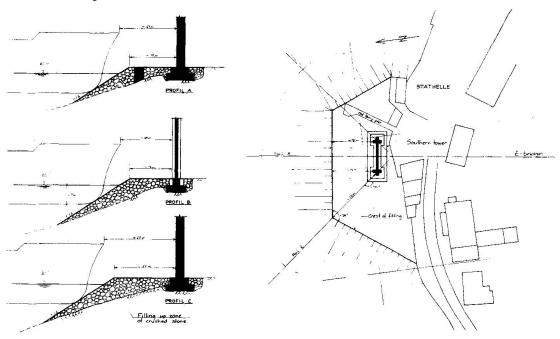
Brevik Bridge; Filling up zone, southern tower
